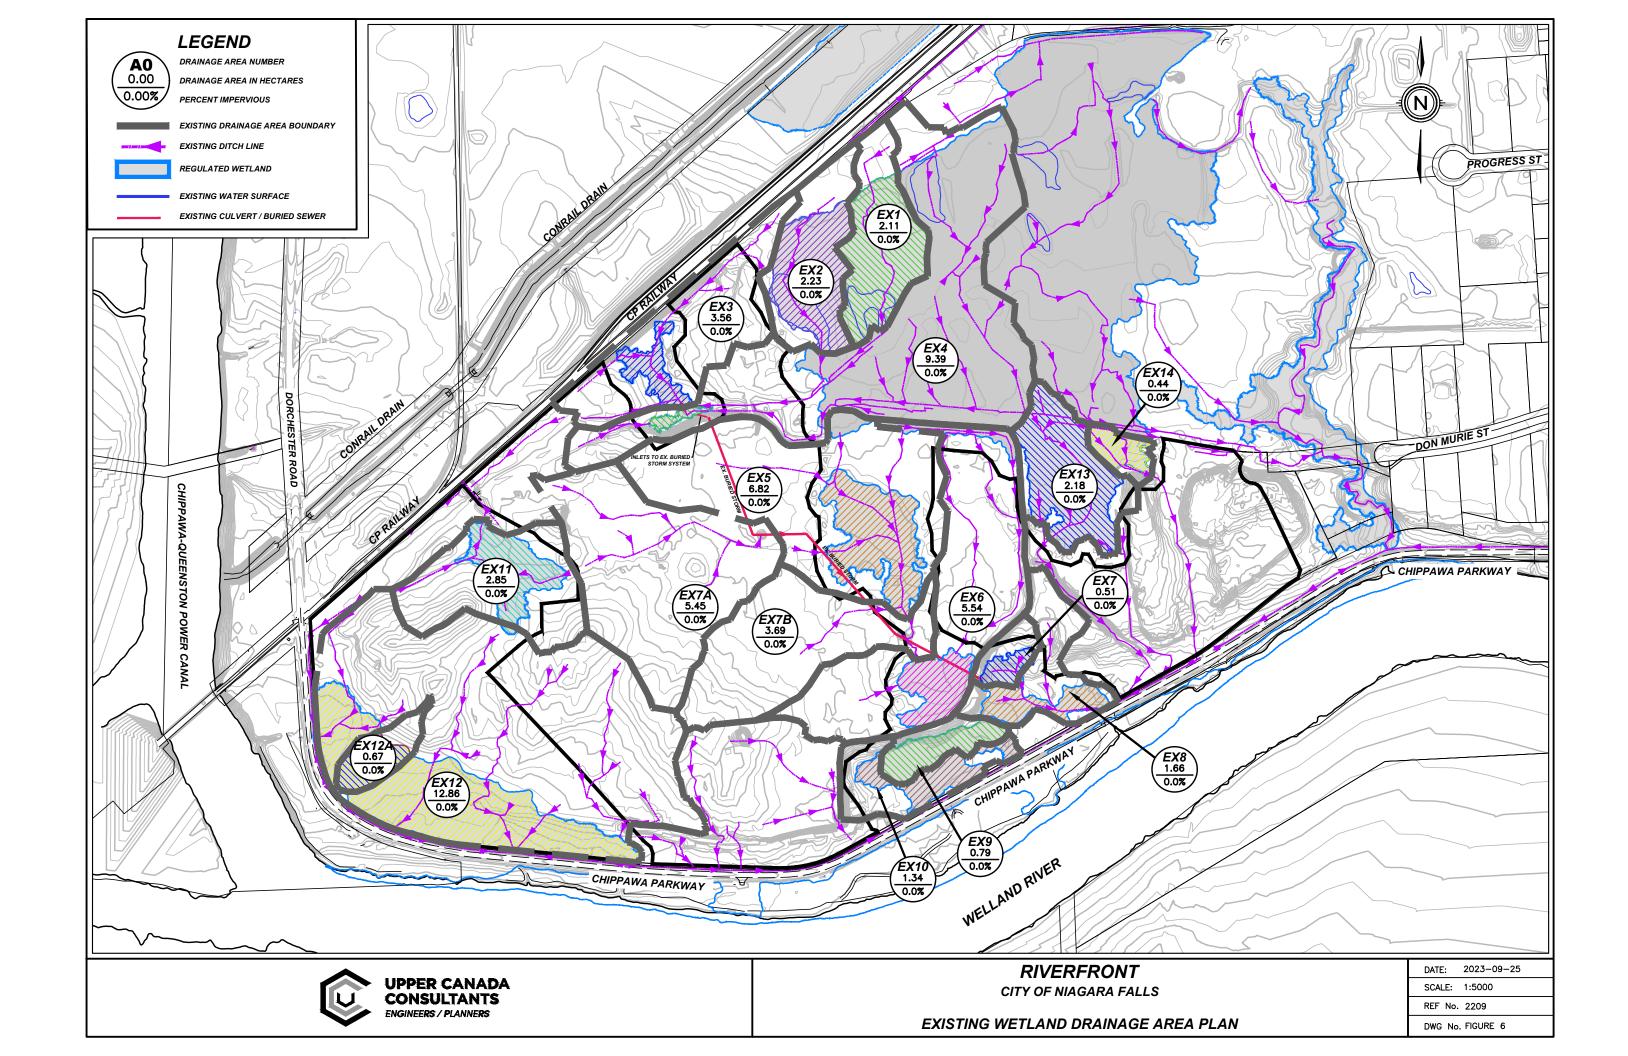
Schematic of Existing Wetland Drainage Area Plan
